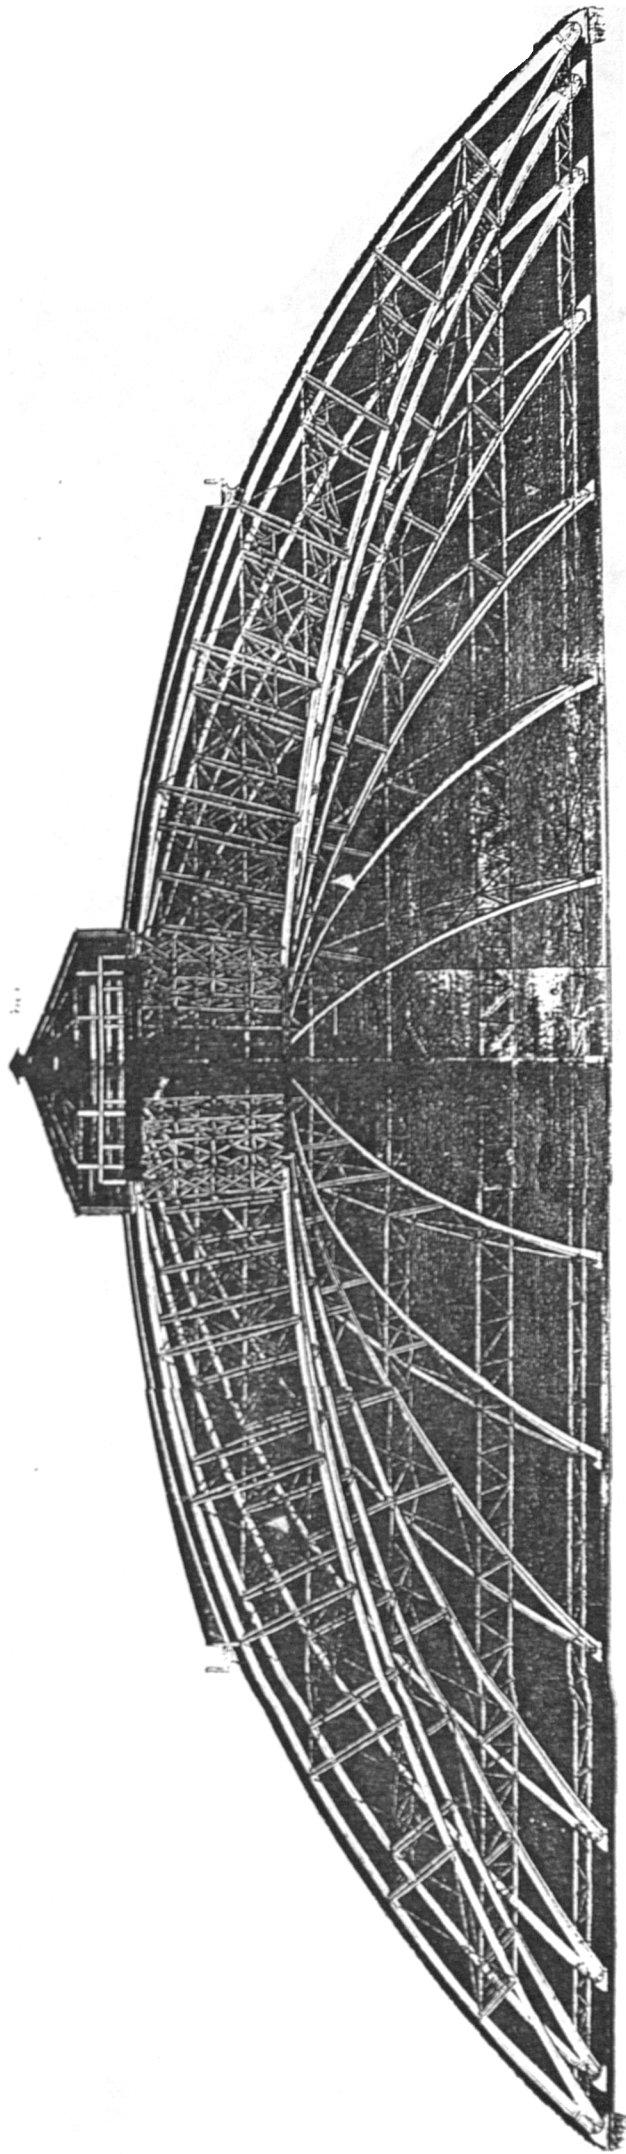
Roof of the Albert Hall, South Kensington, 1867-71
